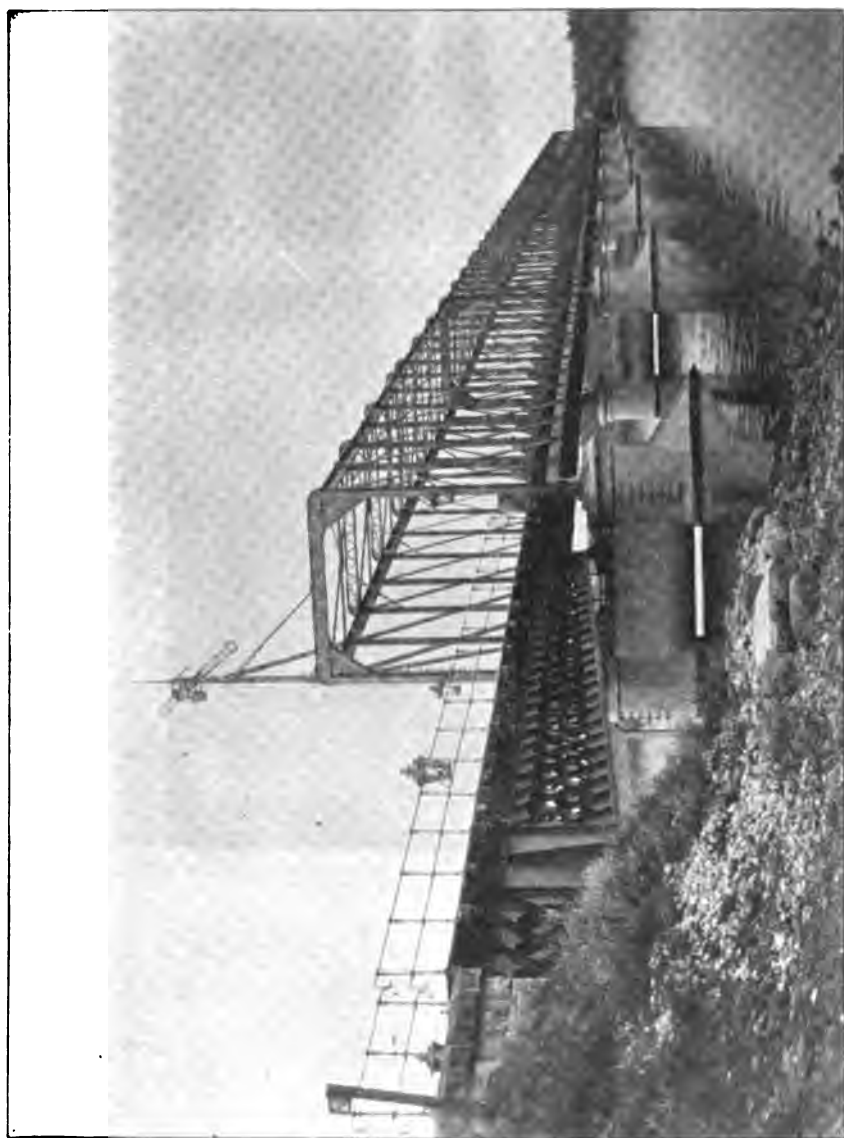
CYLINDER-PIER BRIDGE, RIGA-OREL R. R., RUSSIA.
